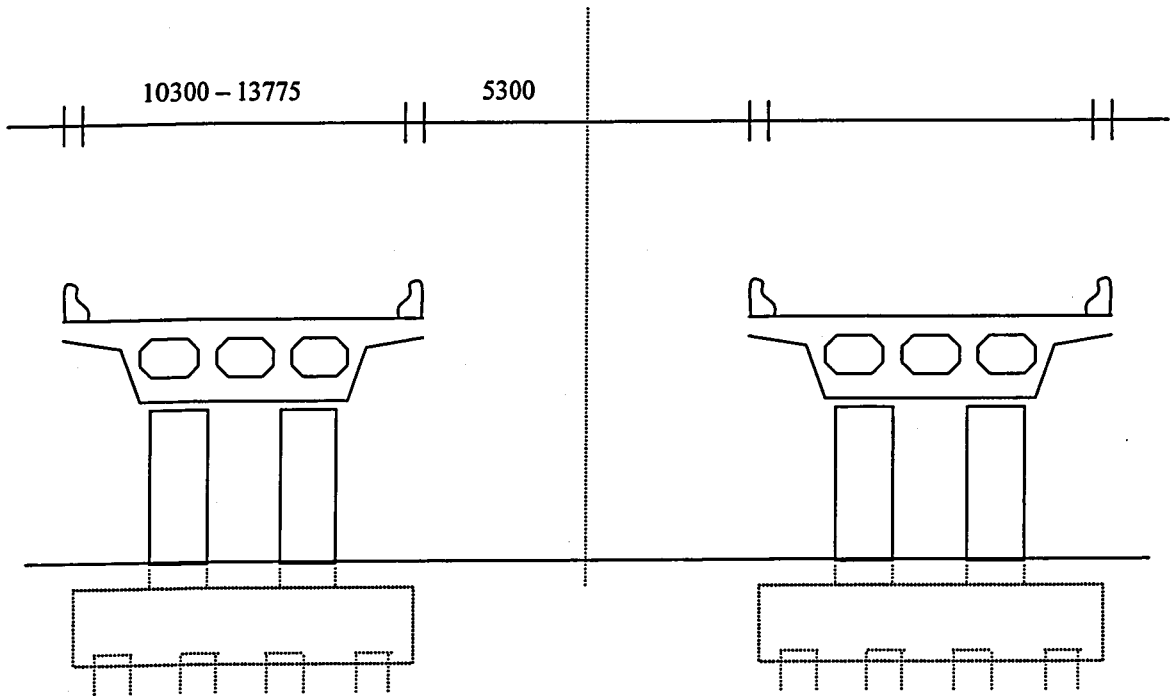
Section of the collapsed bridge, Taipei, Taiwan
